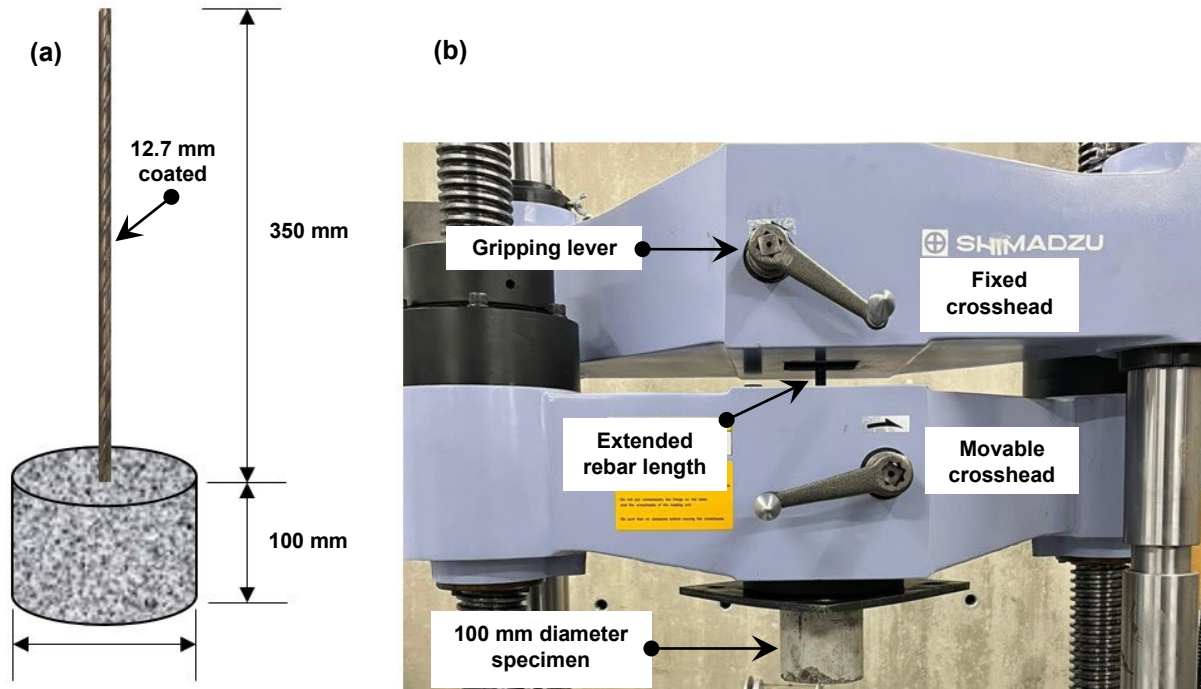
(a) Schematics of pullout test specimen, and (b) Shimadzu universal testing machine showing the pullout test setup.
